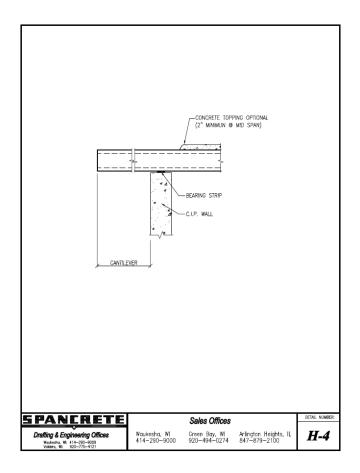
Spancrete Typical Hollow Core Slab to Perpendicular Wall Bearing Connection
